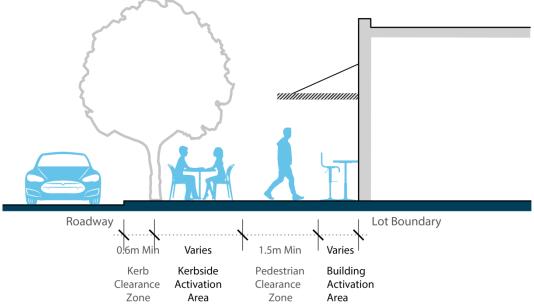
Both Building & Kerbside Activation Areas - Footpaths 3.8 Metres Wide or Greater
